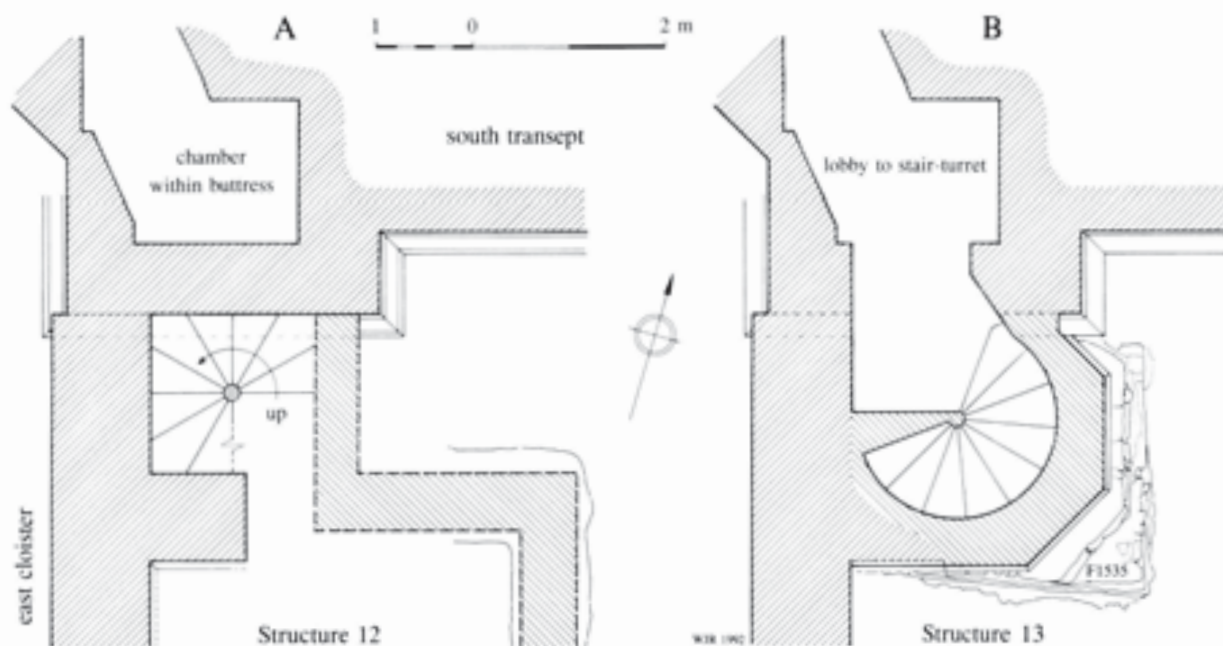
A Reconstructed ground plan of the thirteenth-century stair-turret in Structure 12, adjacent to the east cloister. B Foundation and ground plan of Bubwith's library stair-turret, Structure 13, of c. 1425. Scale 1:80
